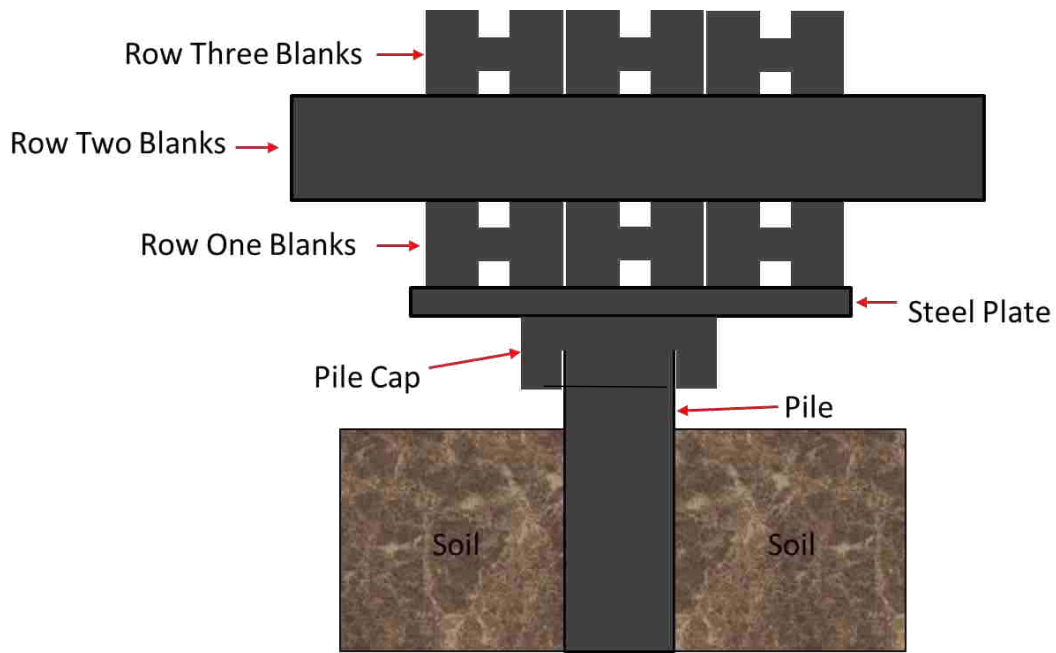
Schematic elevation view of the static loading of the test piles (Not to scale).
